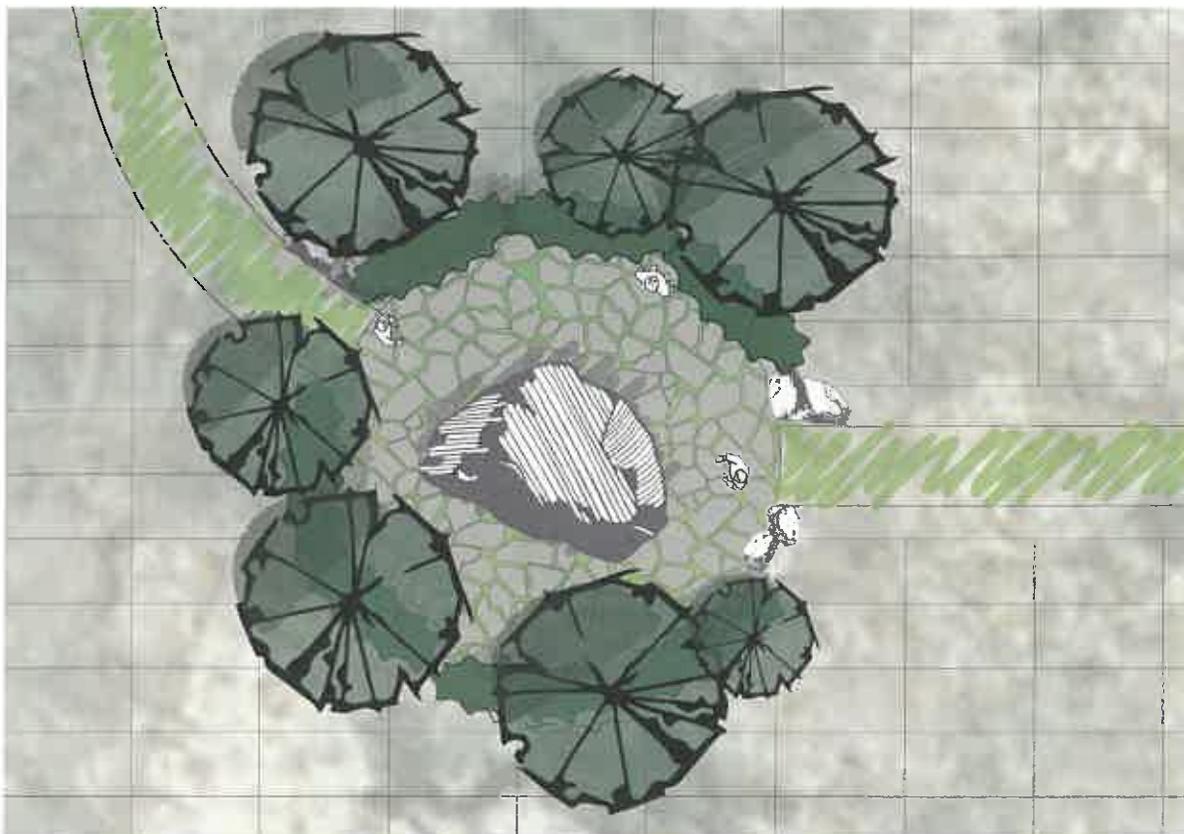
Central Amenity Space Schematic Plan, Not to Scale
